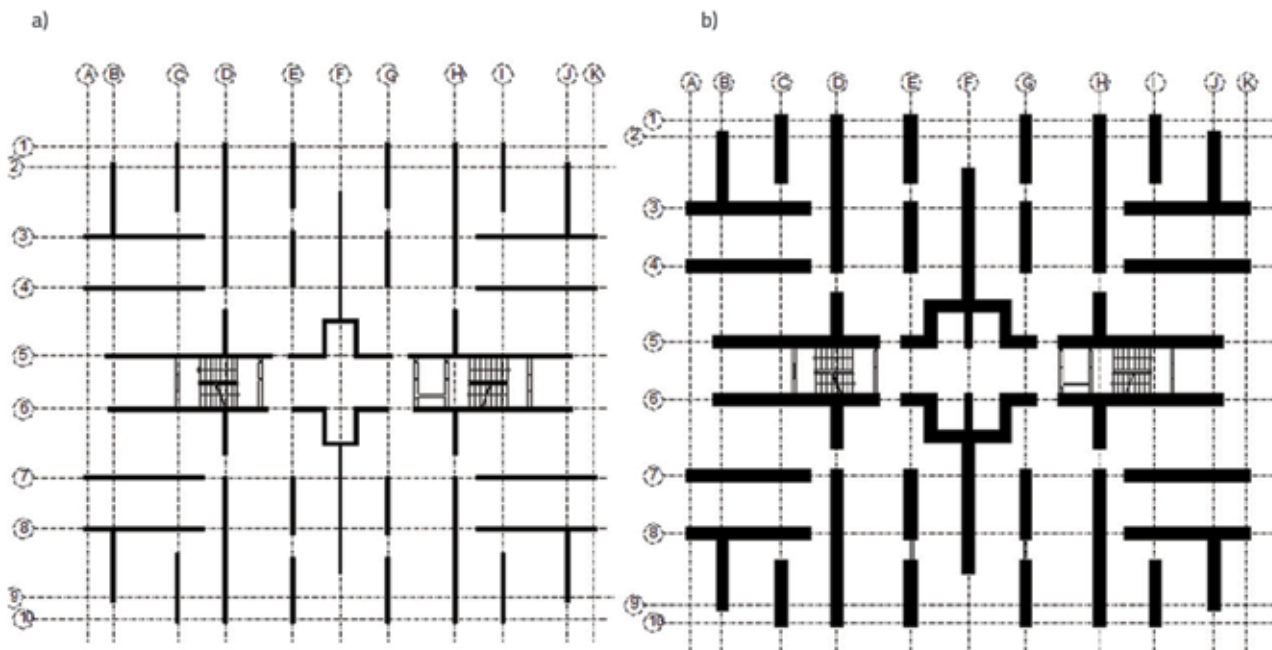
a) Floor plan with two elevators; b) Floor plan with four elevators
